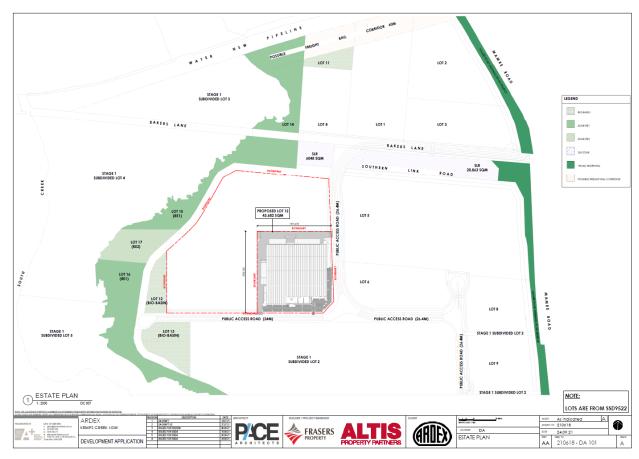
Ardex Warehouse Development Locality Site Plan (dwg no. 210618 - DA 101, issue A)
